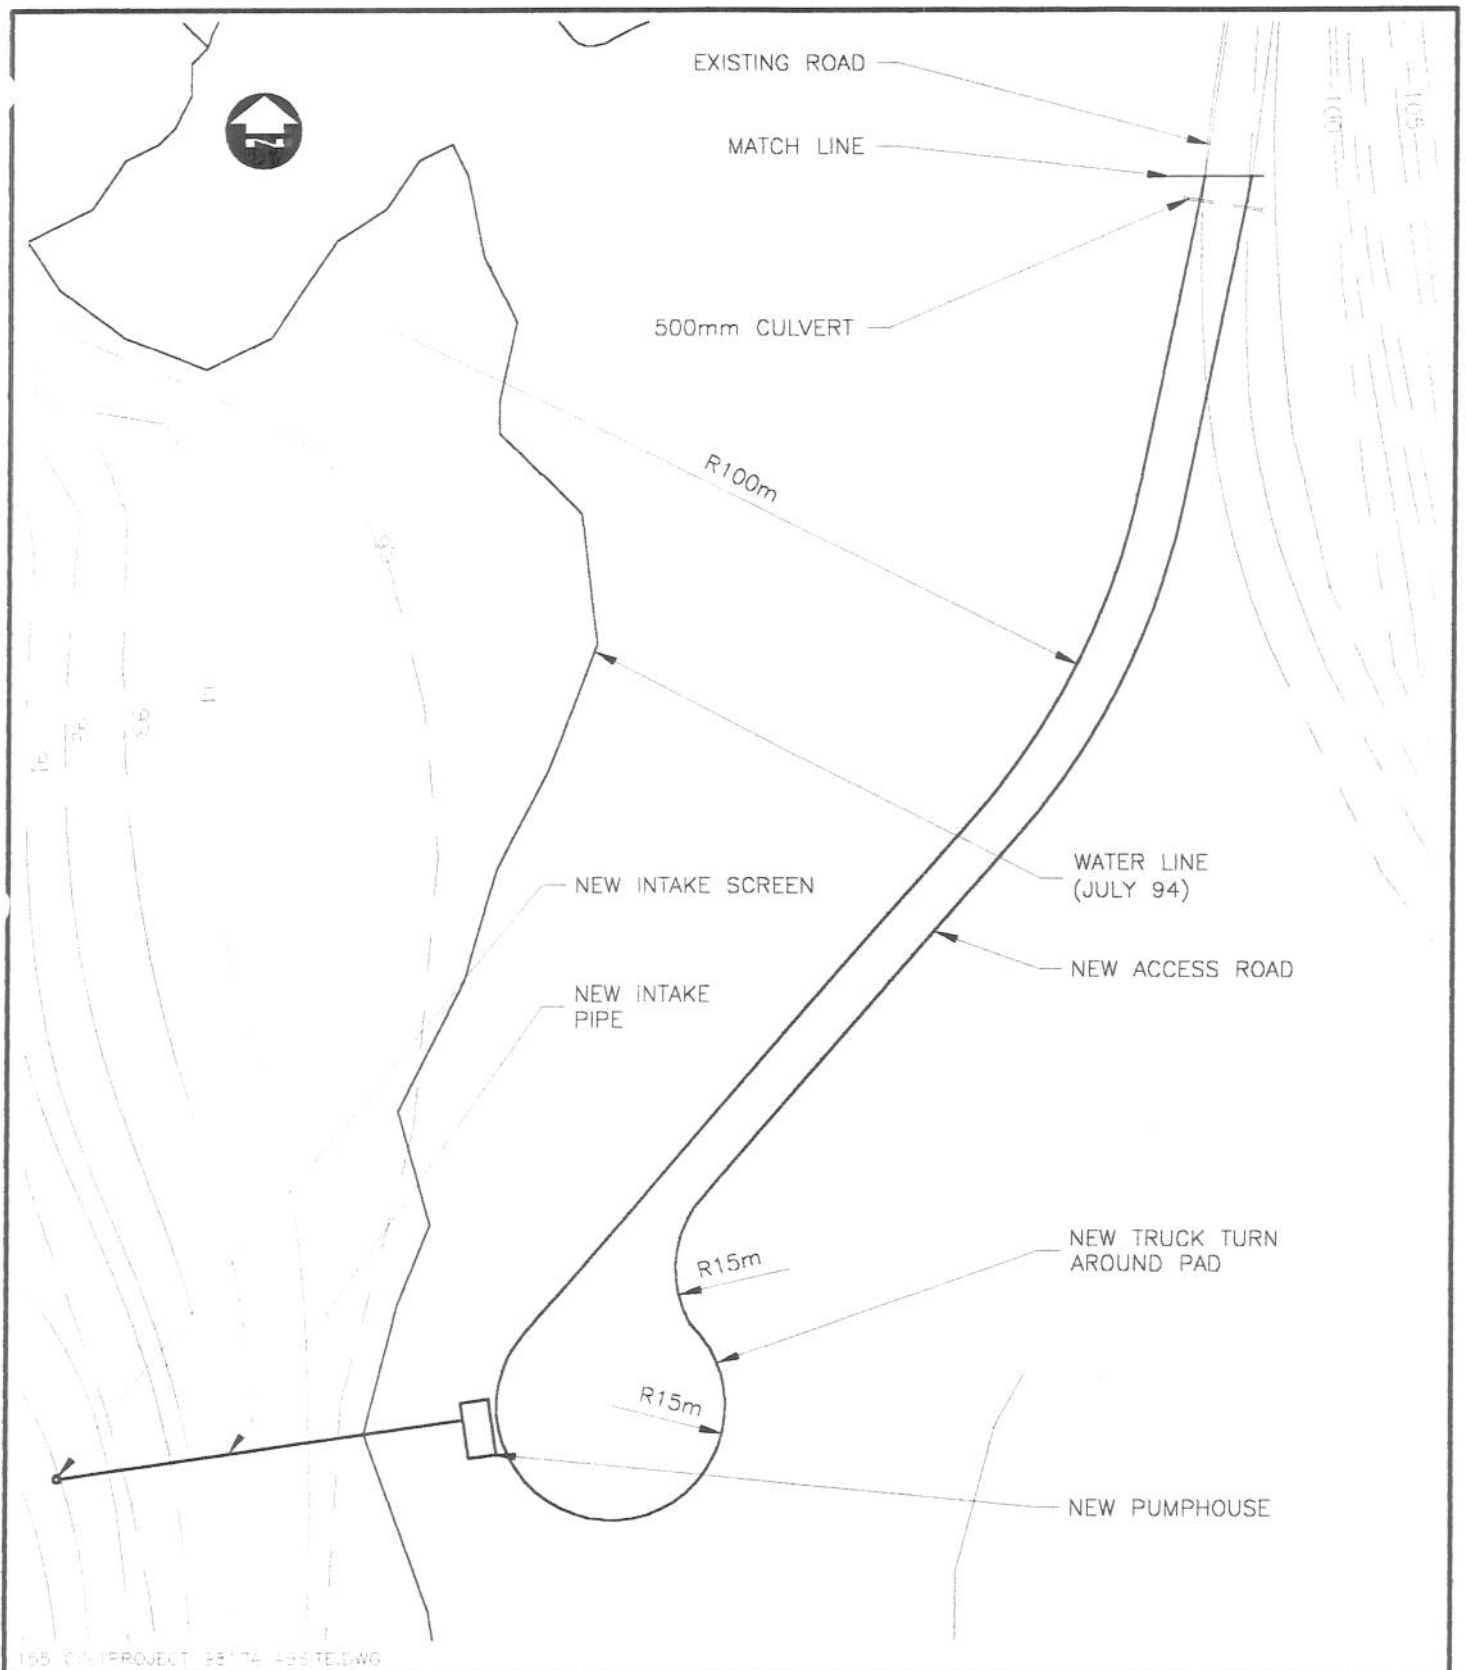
through 4.9 show the site layout for the Clyde River and Arctic Bay truckfill facilities.
